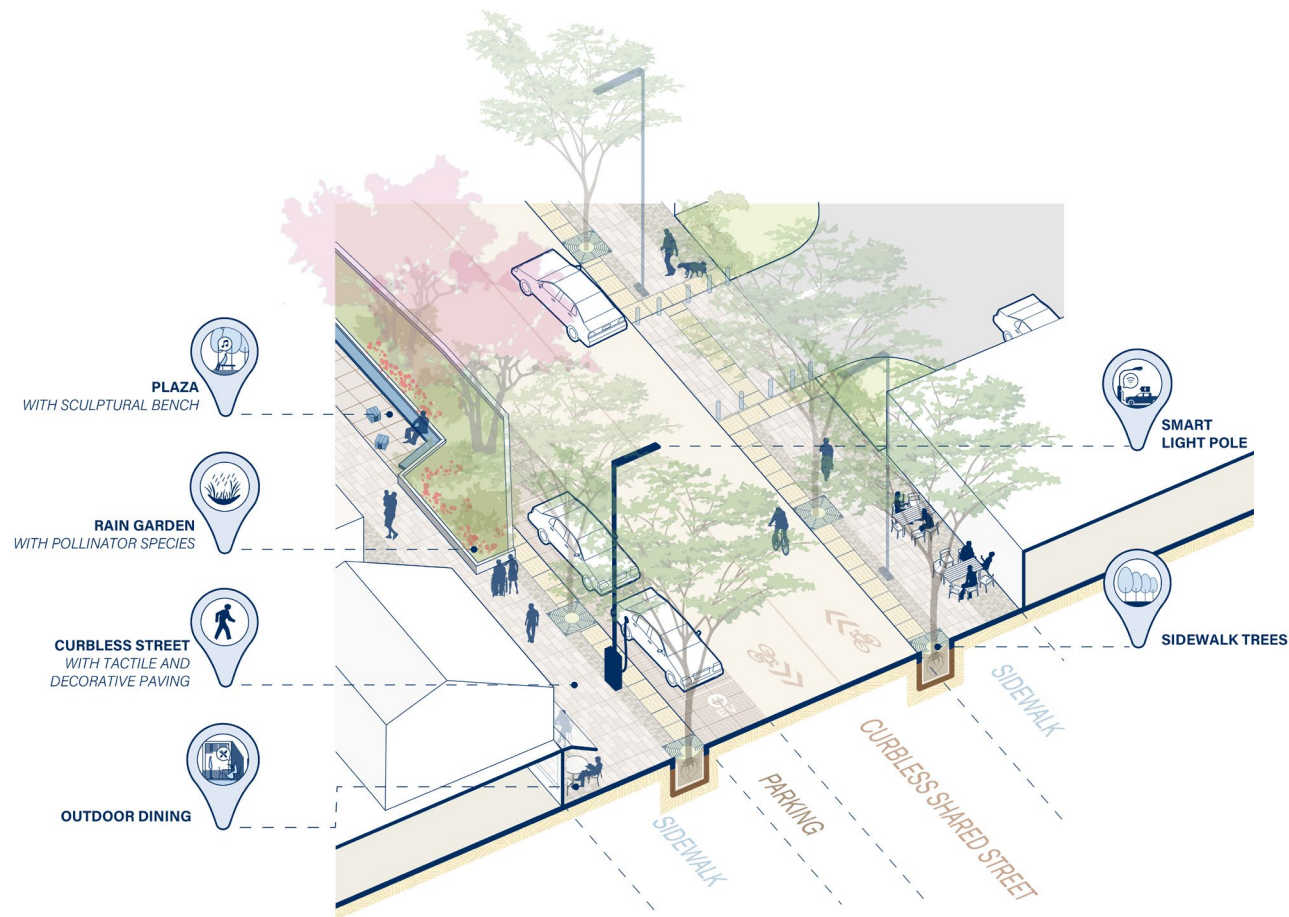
LAUREL STREET AXONOMETRIC (SECTION CUT AT 800 BLOCK OF LAUREL STREET)
